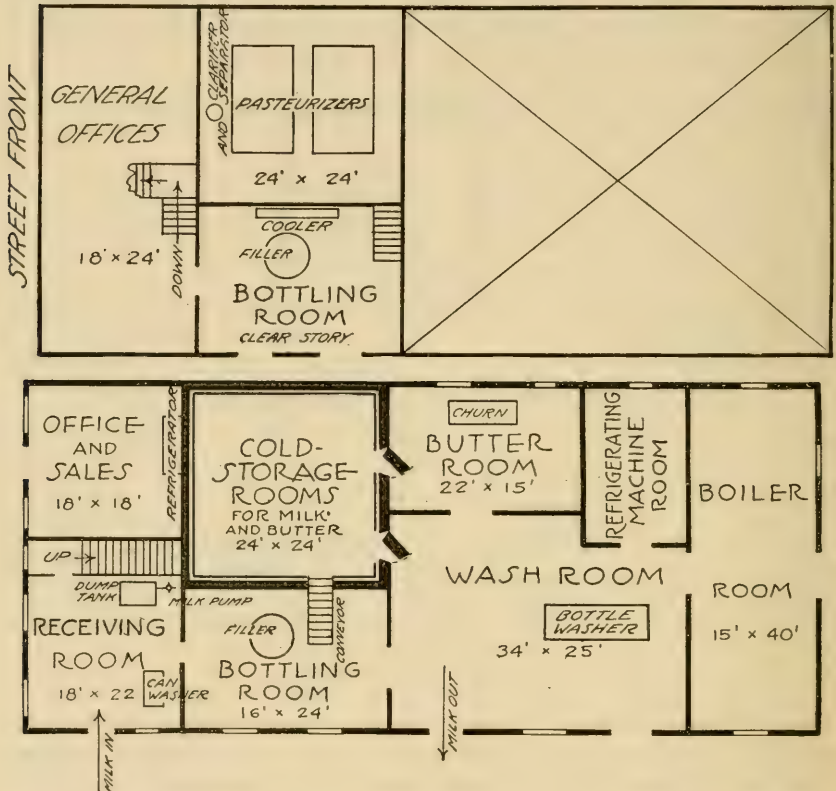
Floor plans for a  $1\frac{1}{2}$ -story plant of from 1,500 to 2,000 gallons' daily capacity, where butter also is handled.
